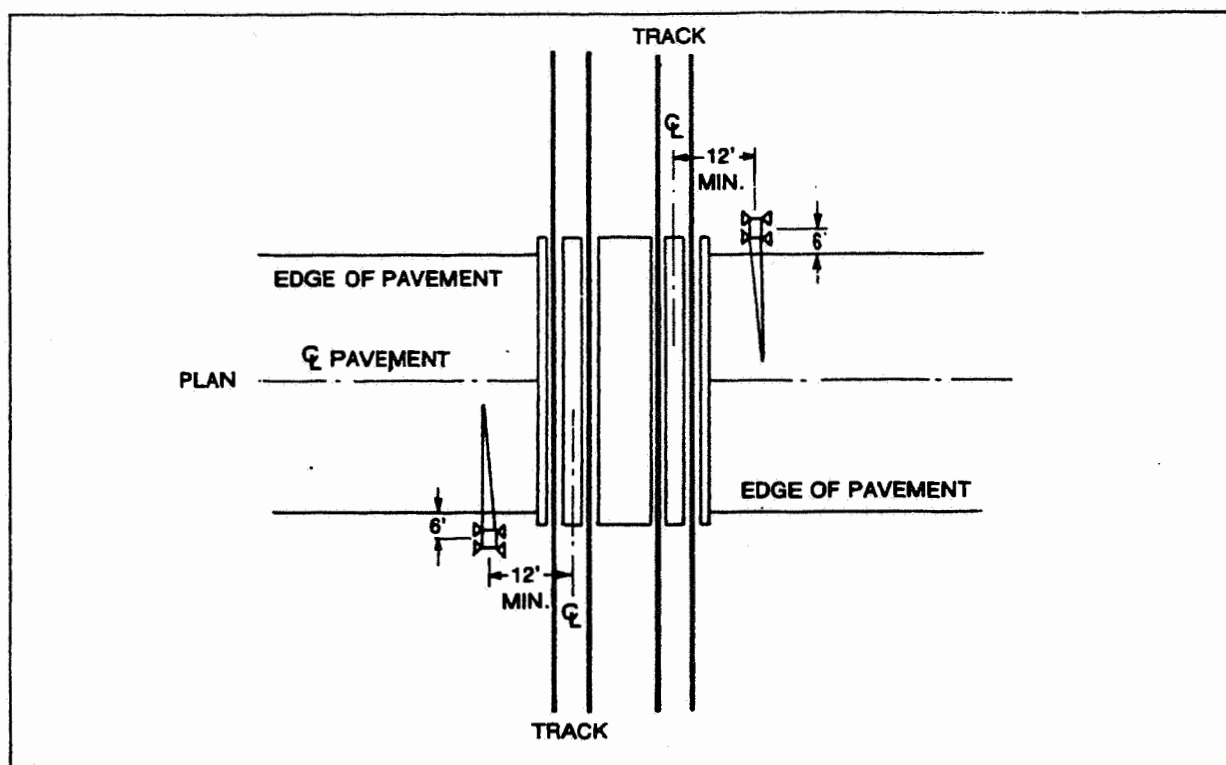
Typical Location Plan for Highway Crossing Signals With or Without Gates for Two-way Highway Traffic (Right Angle)
